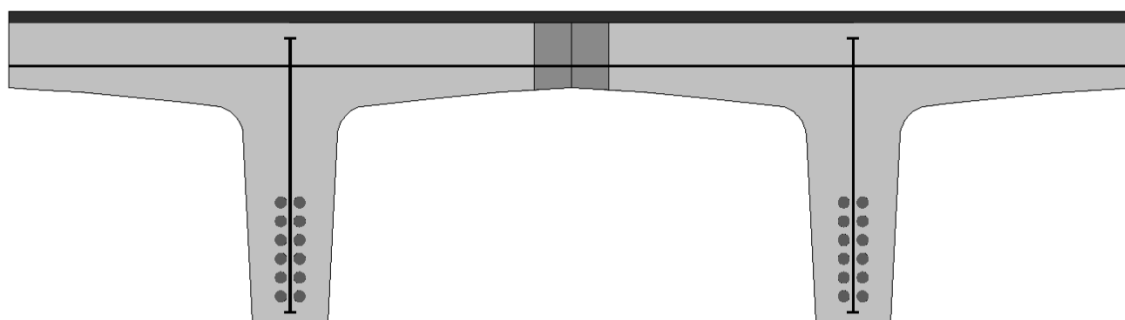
Original precast prestressed HPFRC girders cross section with UHPC longitudinal field connection (Cordon, 2015)
